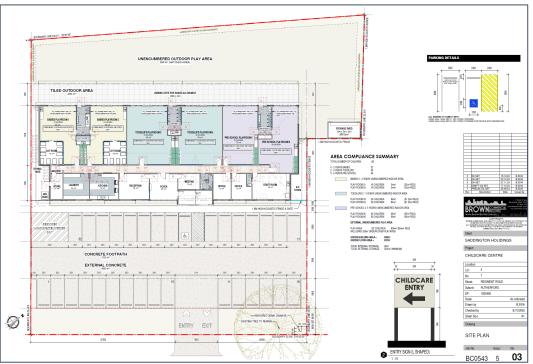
Proposed site plan (Source: Brown Commercial Building)
